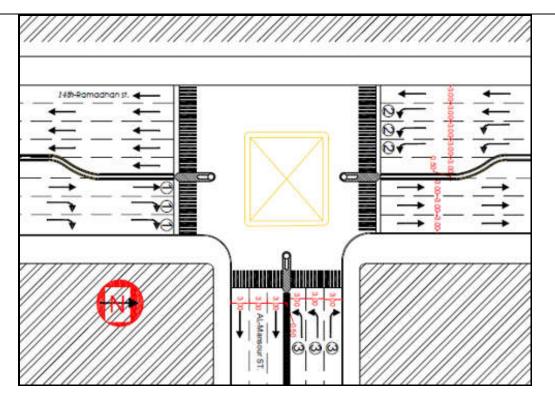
Geometric Layout of Existing LOS and First Proposal
